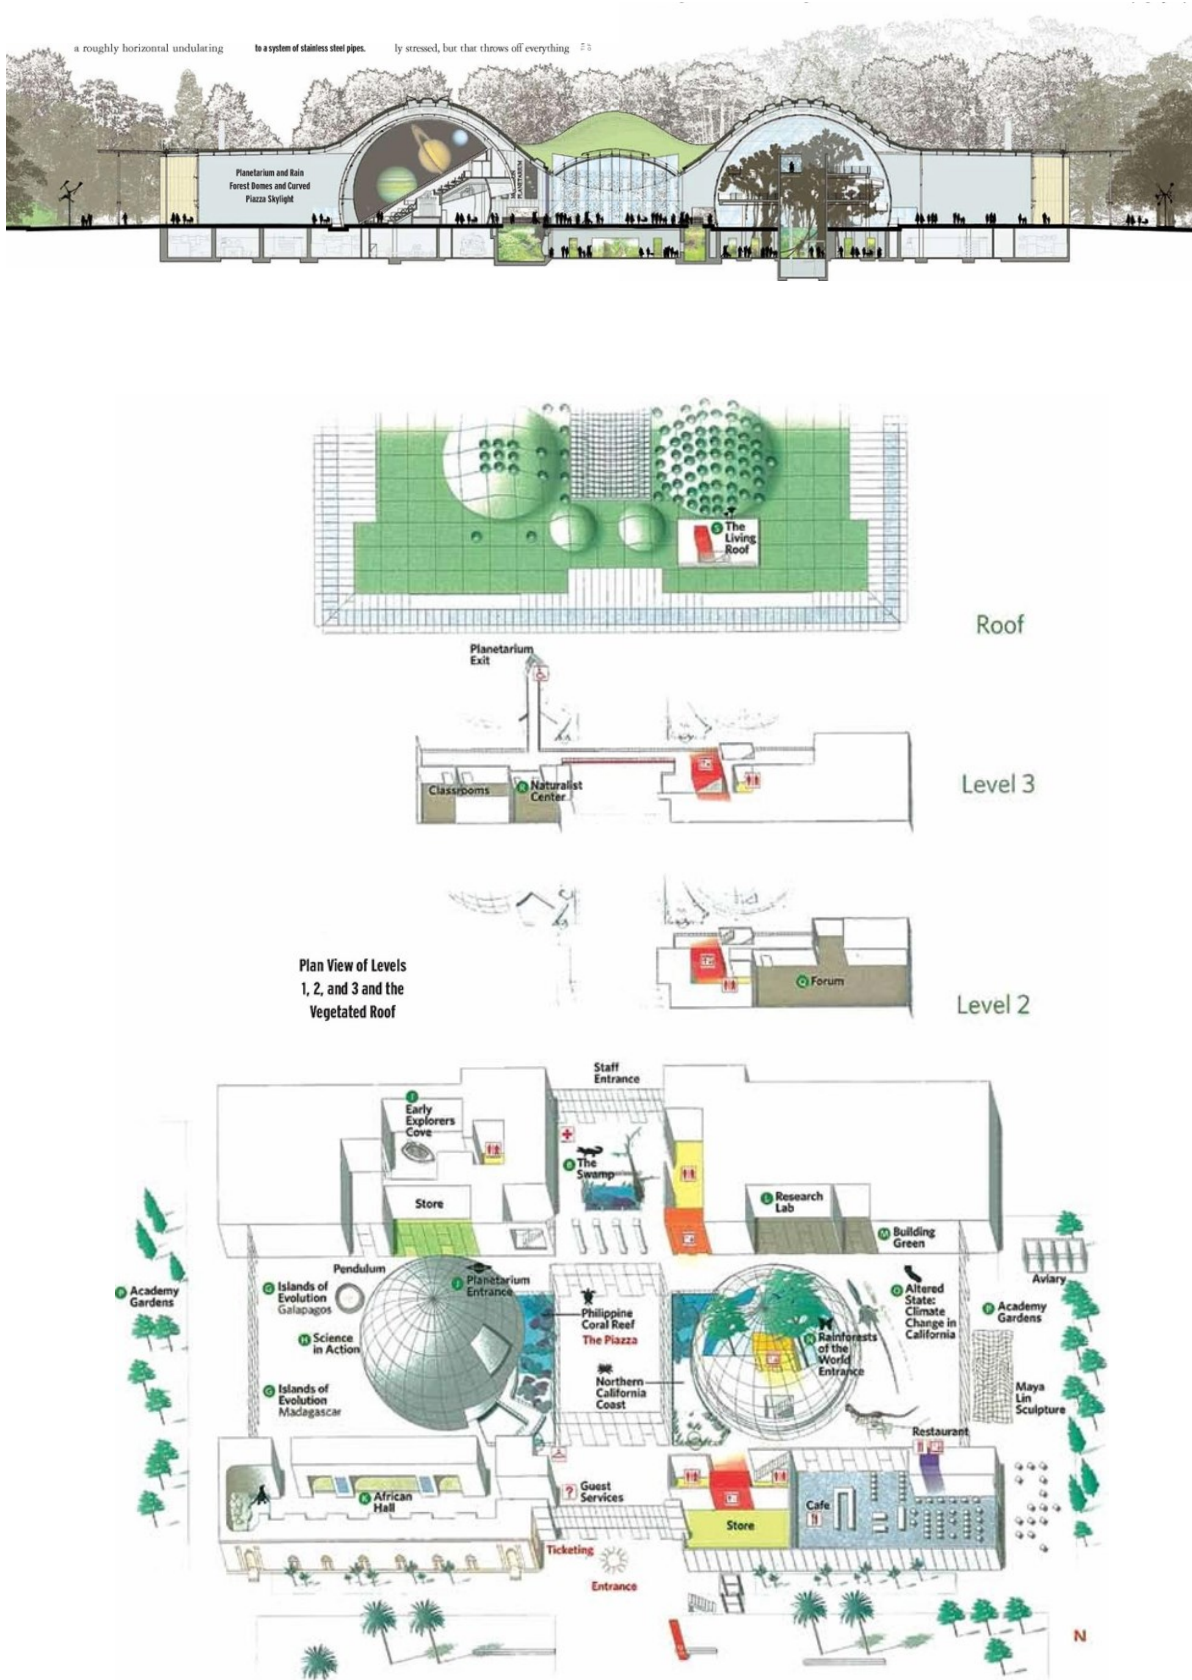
Additional documentation of the California Academy of Sciences. *Top:* Section of the building showing the sinuous roof shape. *Bottom:* Roof plan sketch and axonometry of the building. (Reid, 2009)
